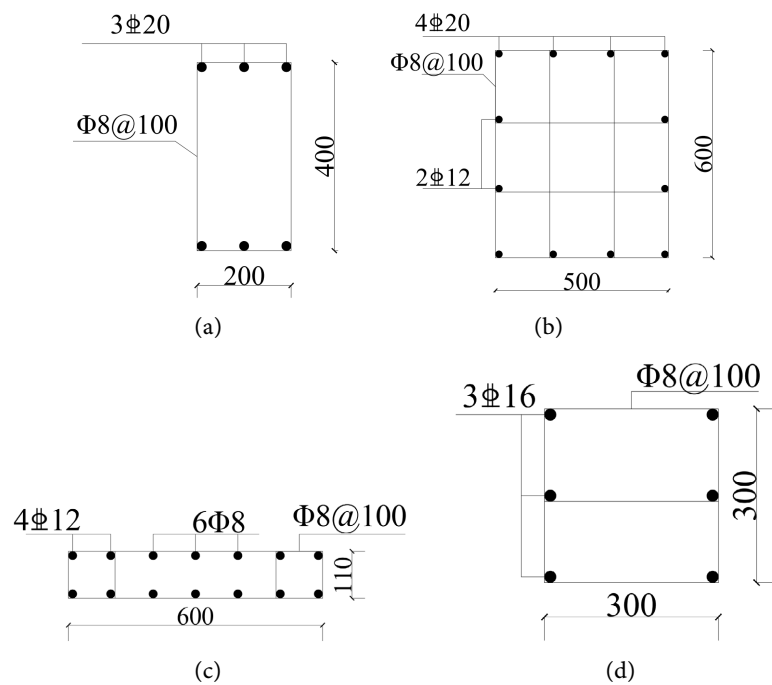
Reinforcement diagram of specimen. (a) Frame top beam reinforcement diagram; (b) Frame bottom beam reinforcement diagram; (c) FRC Energy dissipation wall reinforcement diagram; (d) Frame column reinforcement diagram.
